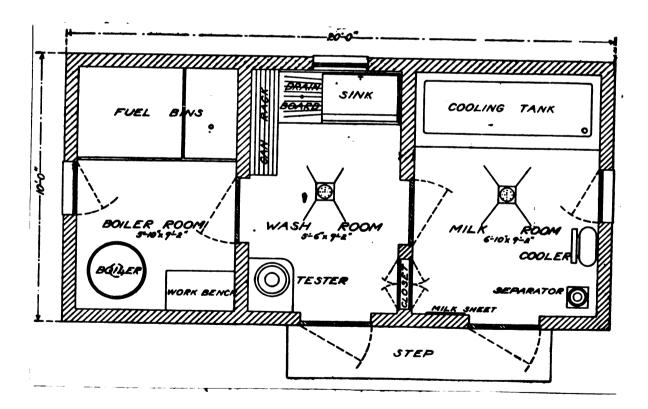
A recommended floor plan for a milk house in 1915. Two rooms were considered necessary, a milk storage room and a washing room.
